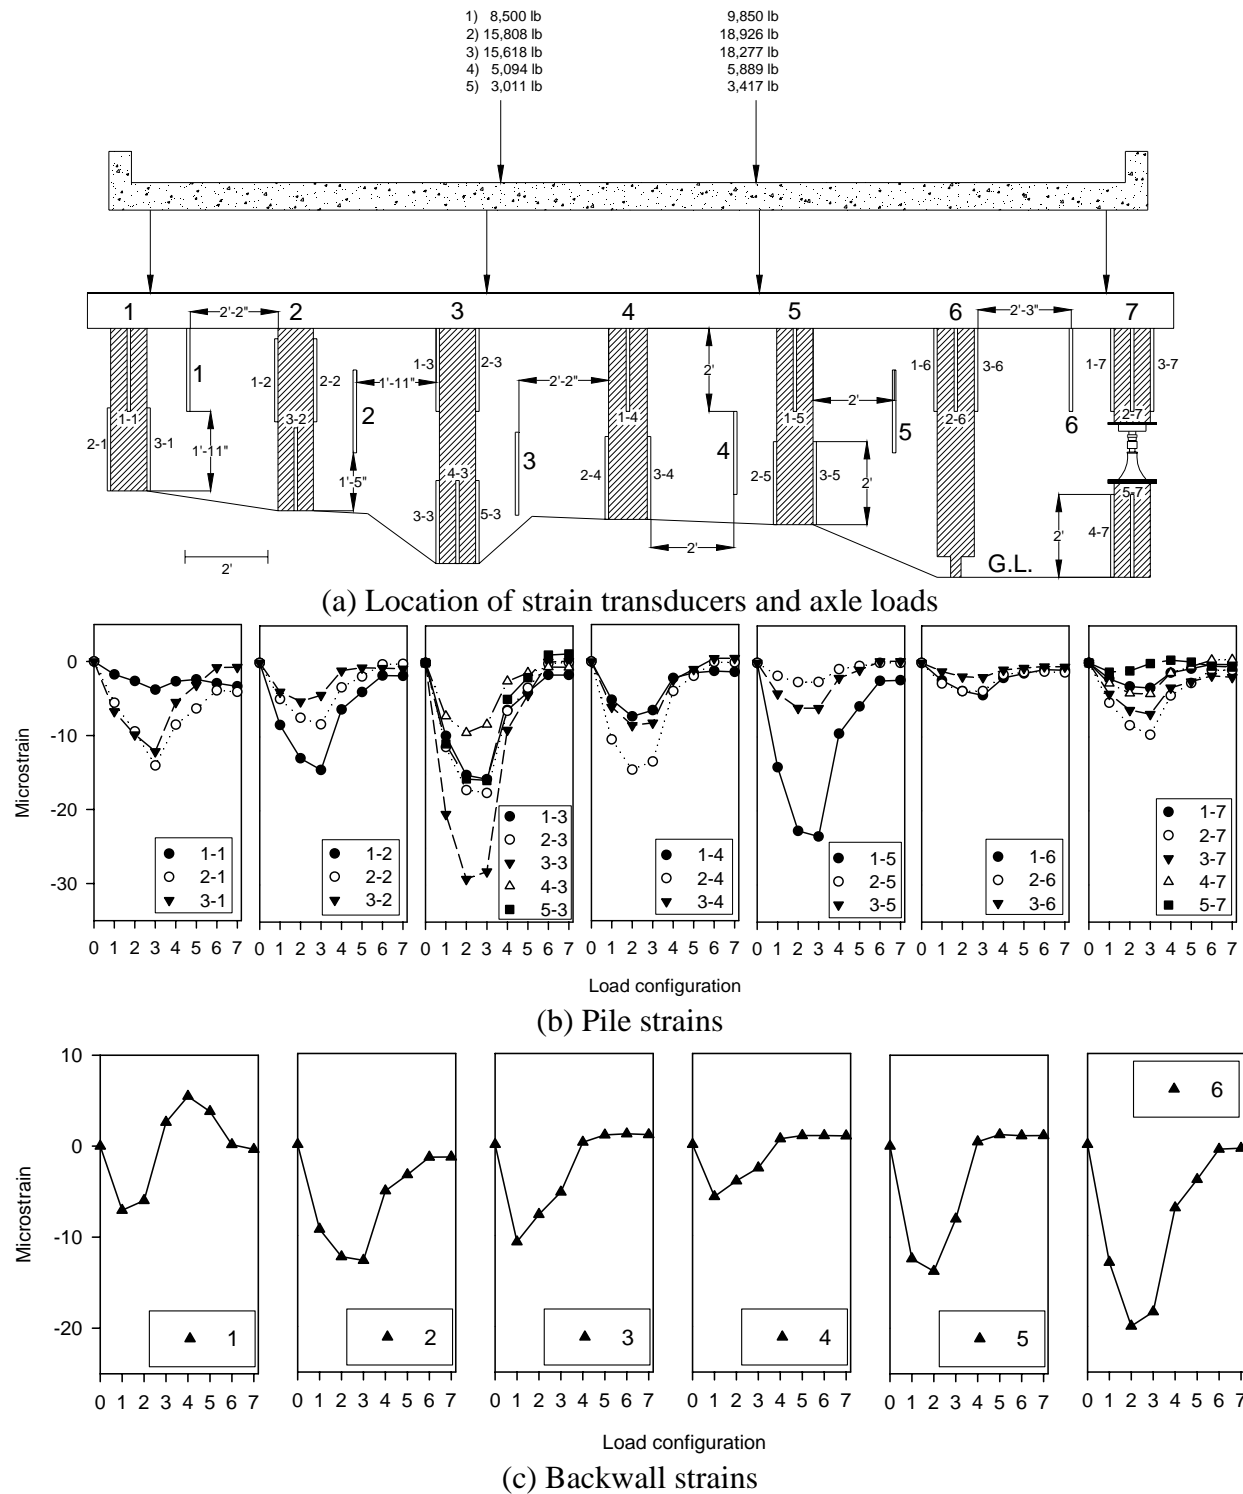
Static load test at the centerline with pile No. 7 jacked (Bridge No. 029070 – Humboldt County)
